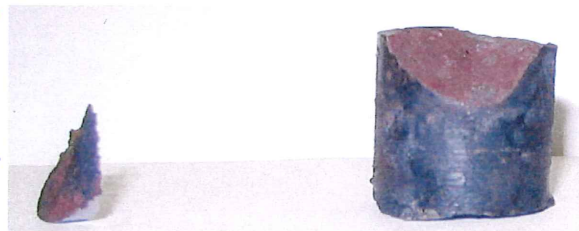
Crack in the Girder Web Photo/ODOT
